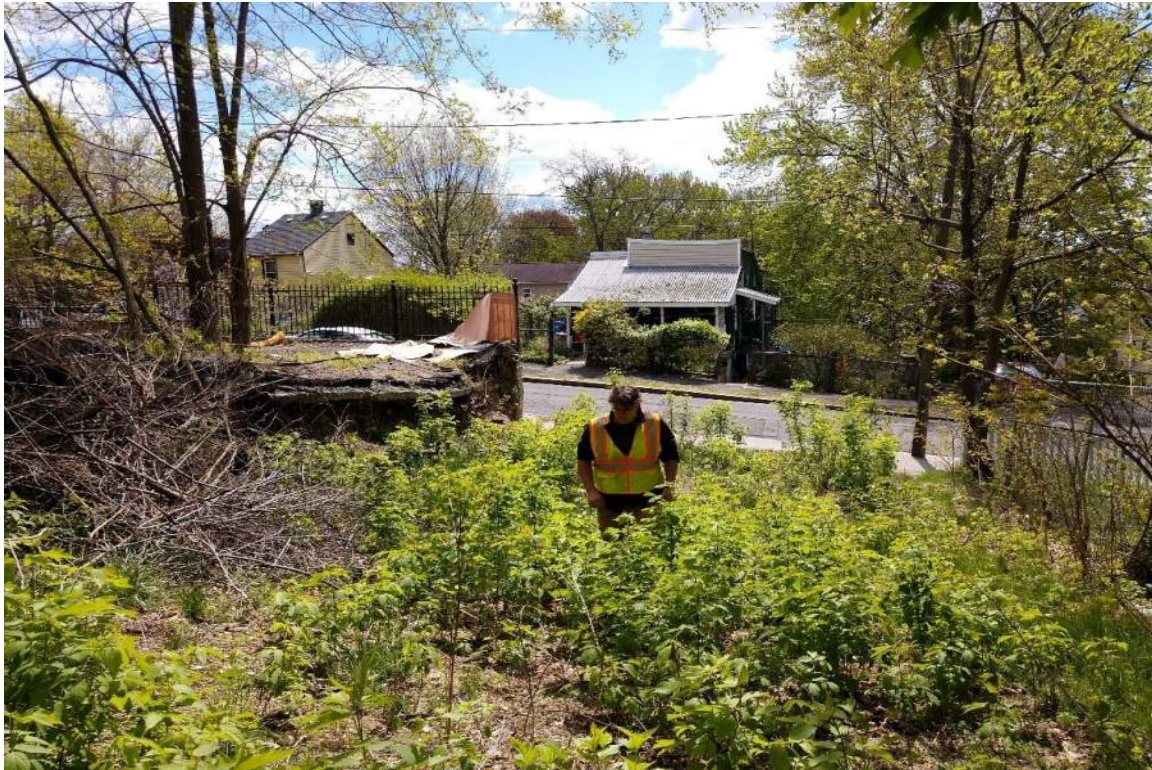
The landscape rises to the west from Krank Street. View to the east.
